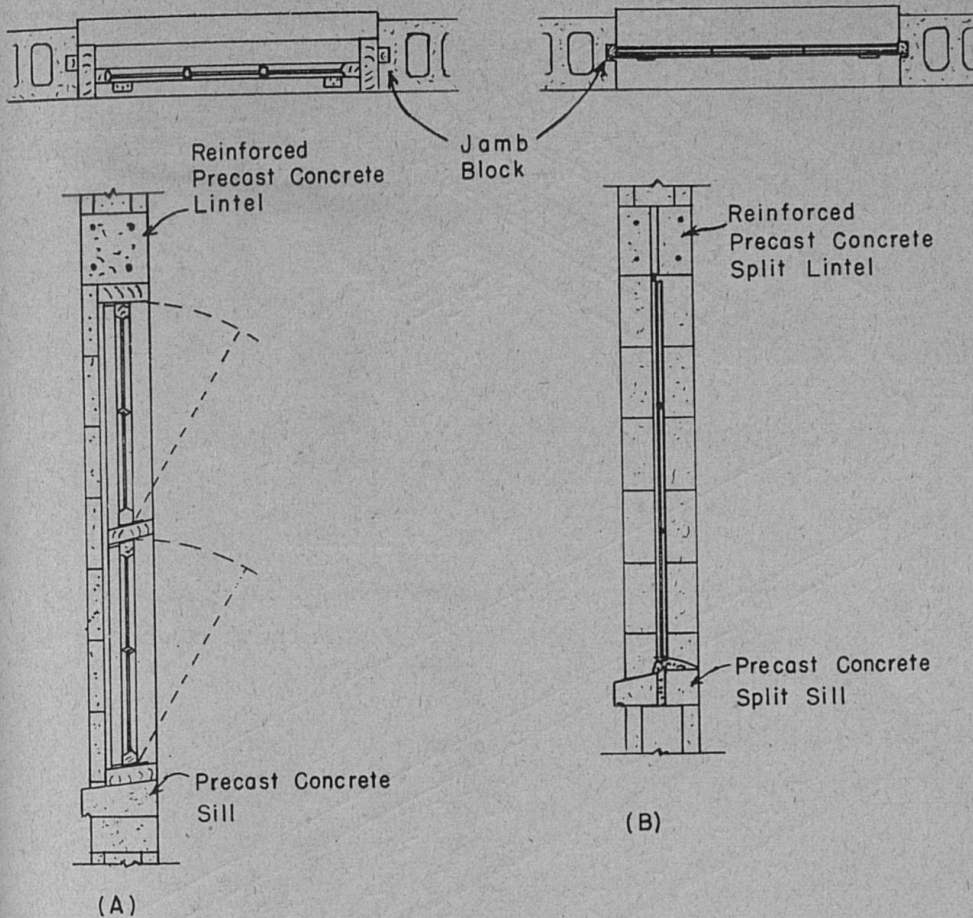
Placing of wooden frames differs from putting in steel frames in that the wooden frames are bolted into the mortar joints similar to the way in which a door is secured, while steel frames have flanges extending into the split sill and lintel and into the outer cores of the blocks. The flanges are secured in mortar.
